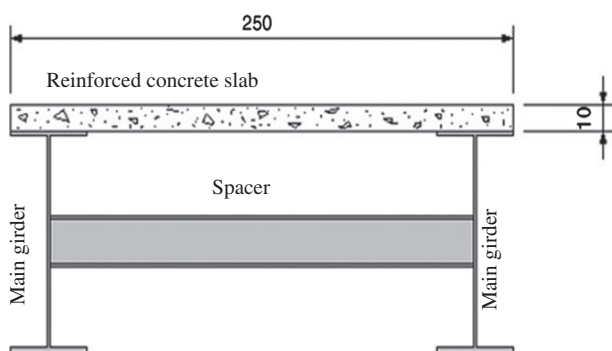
Typical bridge cross-section (Figueiredo et al. [10]).
